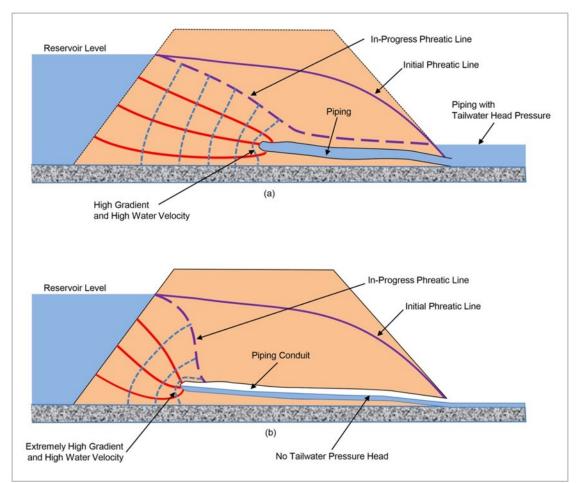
Section View of Piezometric Level Decreases Indicative of Piping
